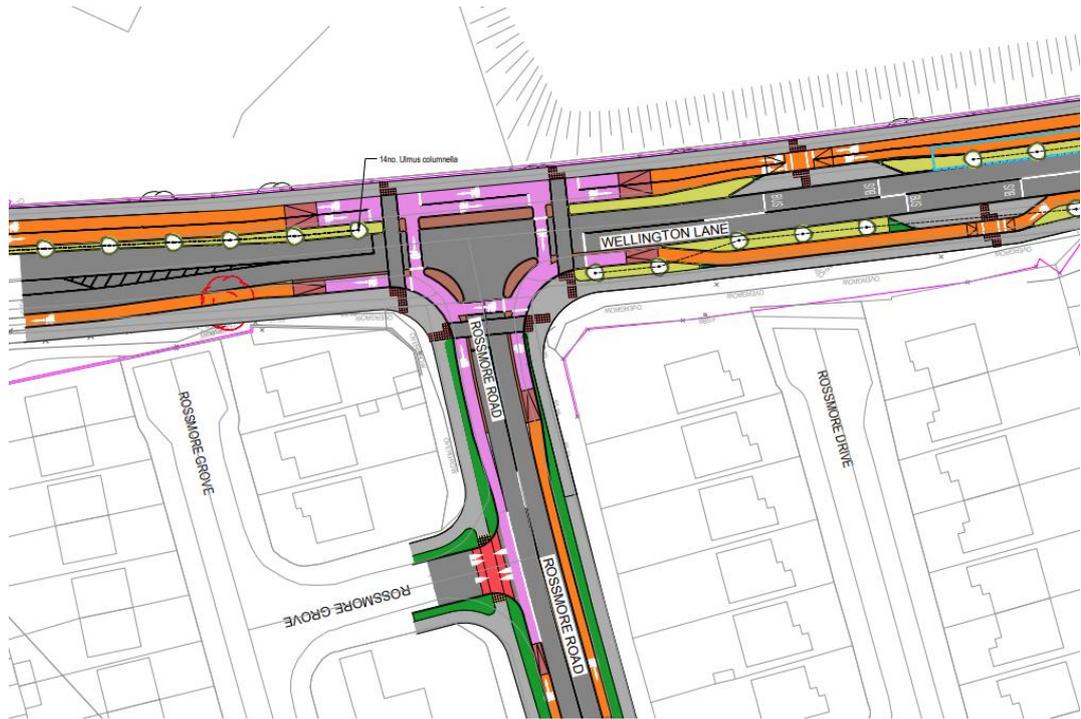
Landscape Proposals between Spawell Roundabout and Orwell Roundabout
